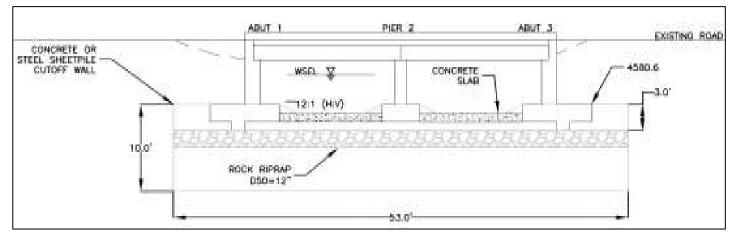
Cross-sectional view of Bridge J-01-D with recommended hydraulic scour countermeasure
